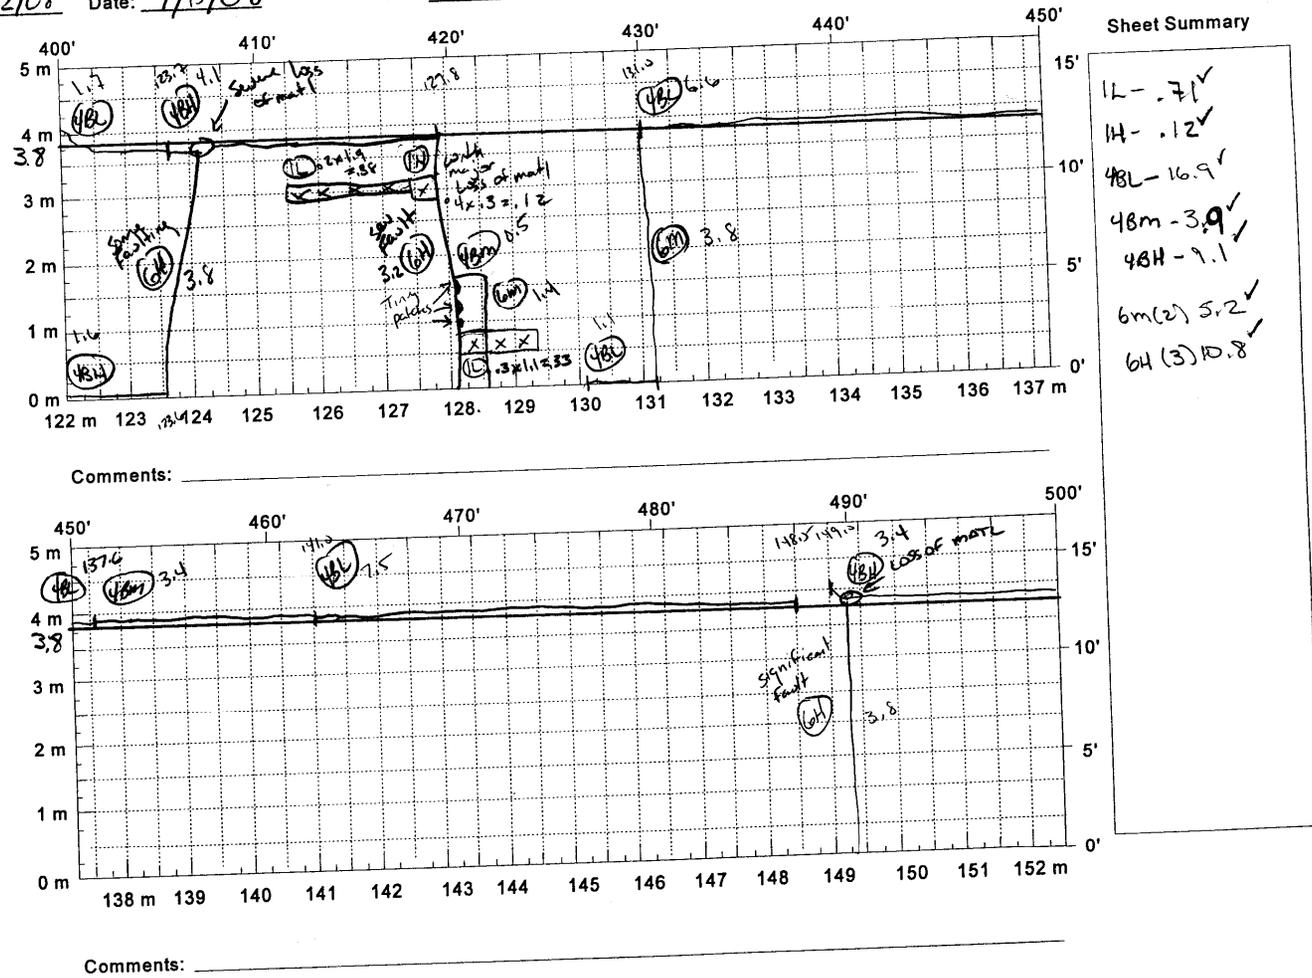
Pavement Distress Map; Station 4+00 to 5+00; Section 0506.
